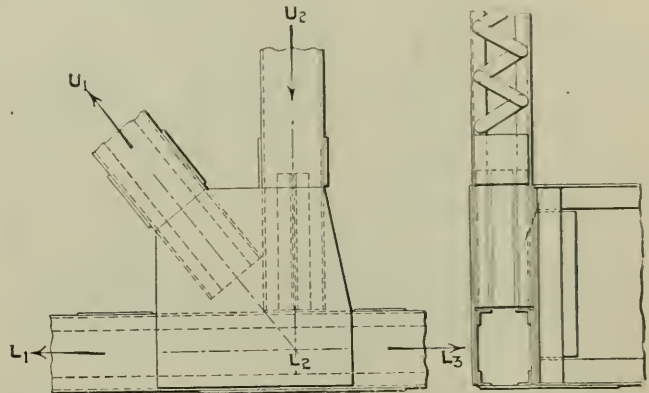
GUSSET-PLATE CONNECTION AT BOTTOM-CHORD JOINT OF RIVETED TRUSS
